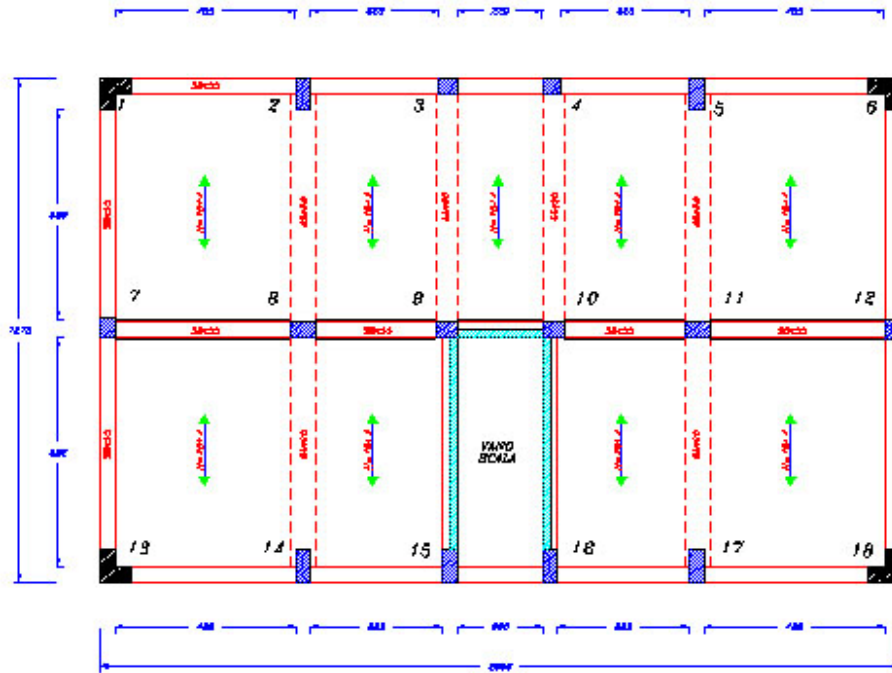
A: Seismic Strengthening Techniques : Floor Plan of a Strengthened Building
